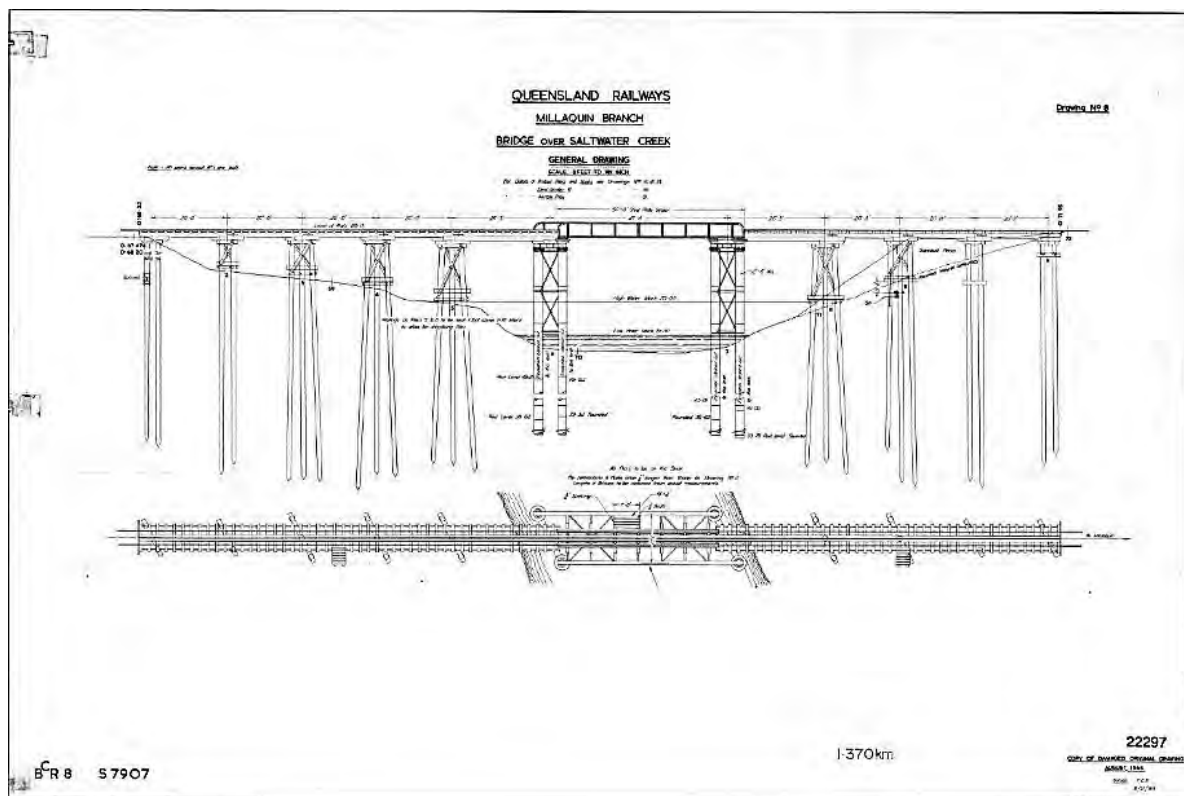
Original General Arrangement Drawing, copy of damaged original (Provided by BRC).
